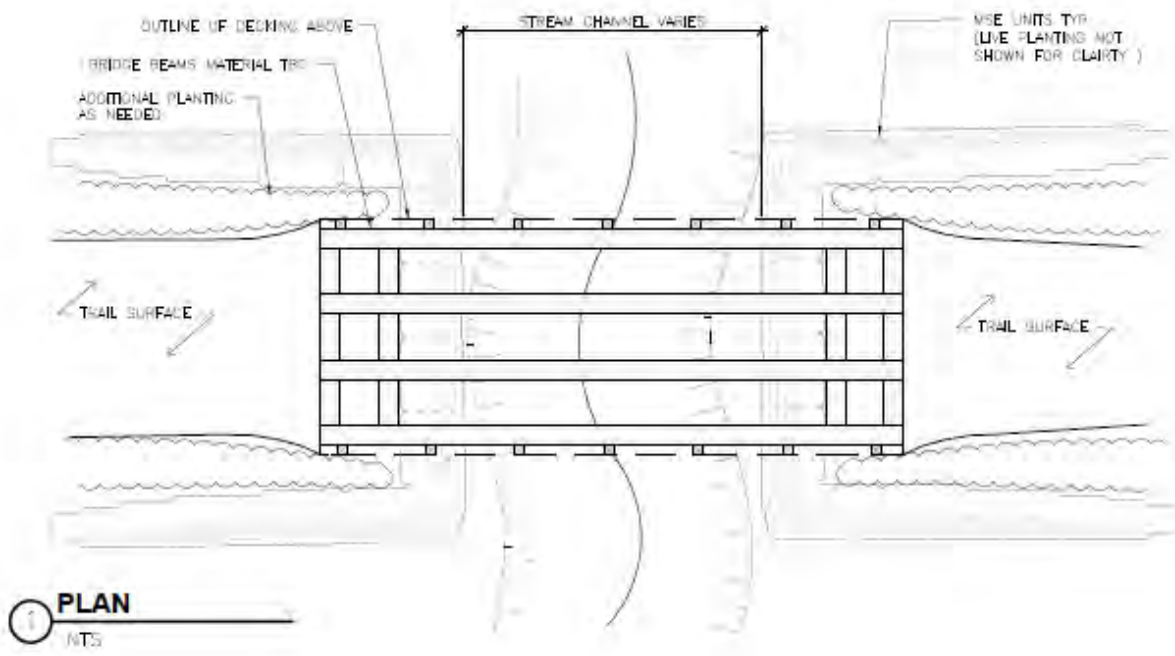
Example of Geotextile bag technology used as a bridge abutment.
